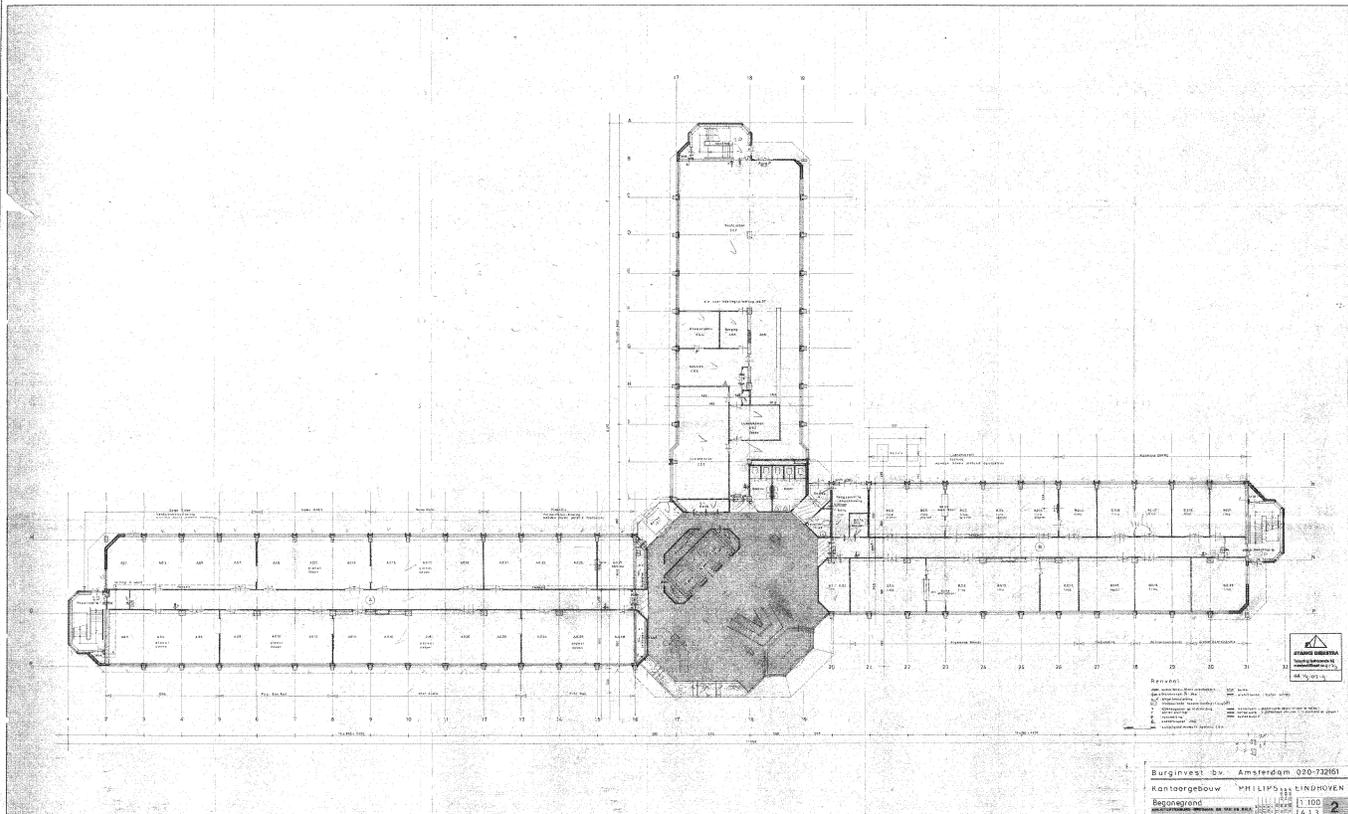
| Original ground floor plan HCZ building (M. Brentjes, personal communication, January 15 2021)
